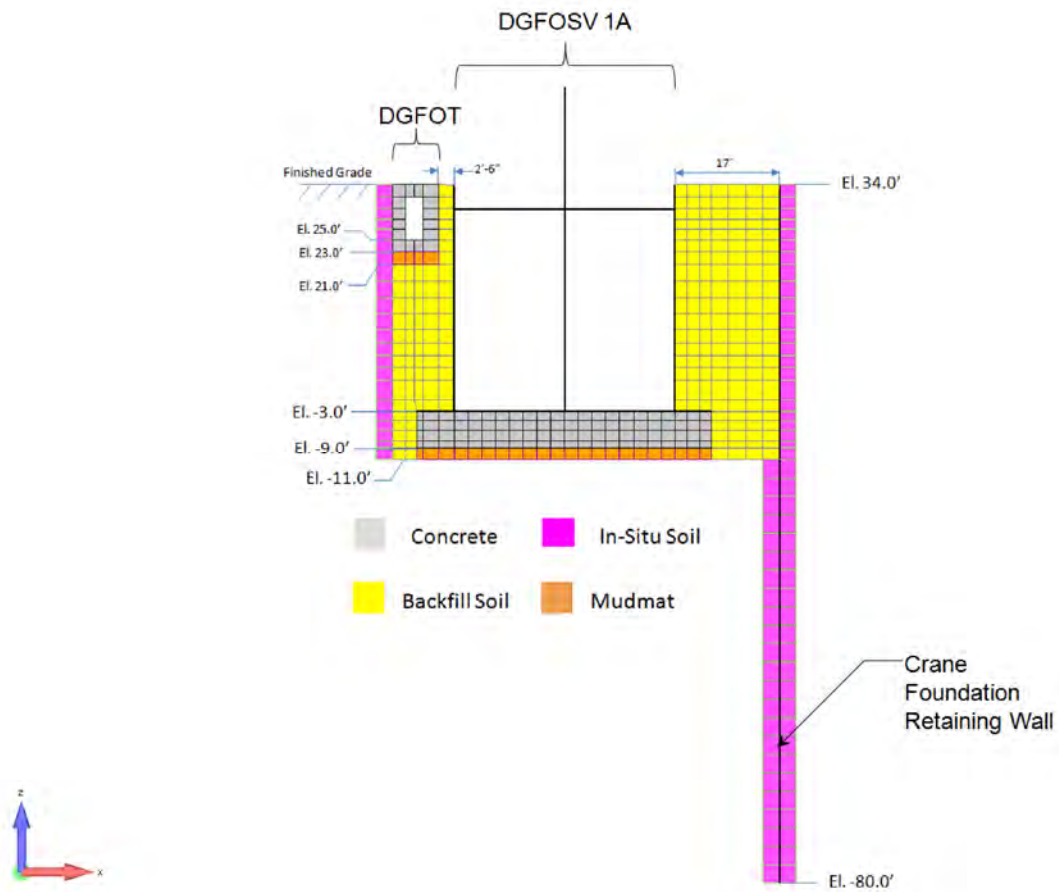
H.6-225 2D SSSI Model of DGFOT, DGFOV and Crane Foundation Retaining Wall
